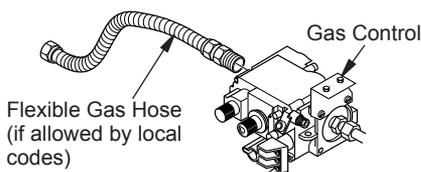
Attaching Flexible Gas Hose to Heater Gas Regulator
